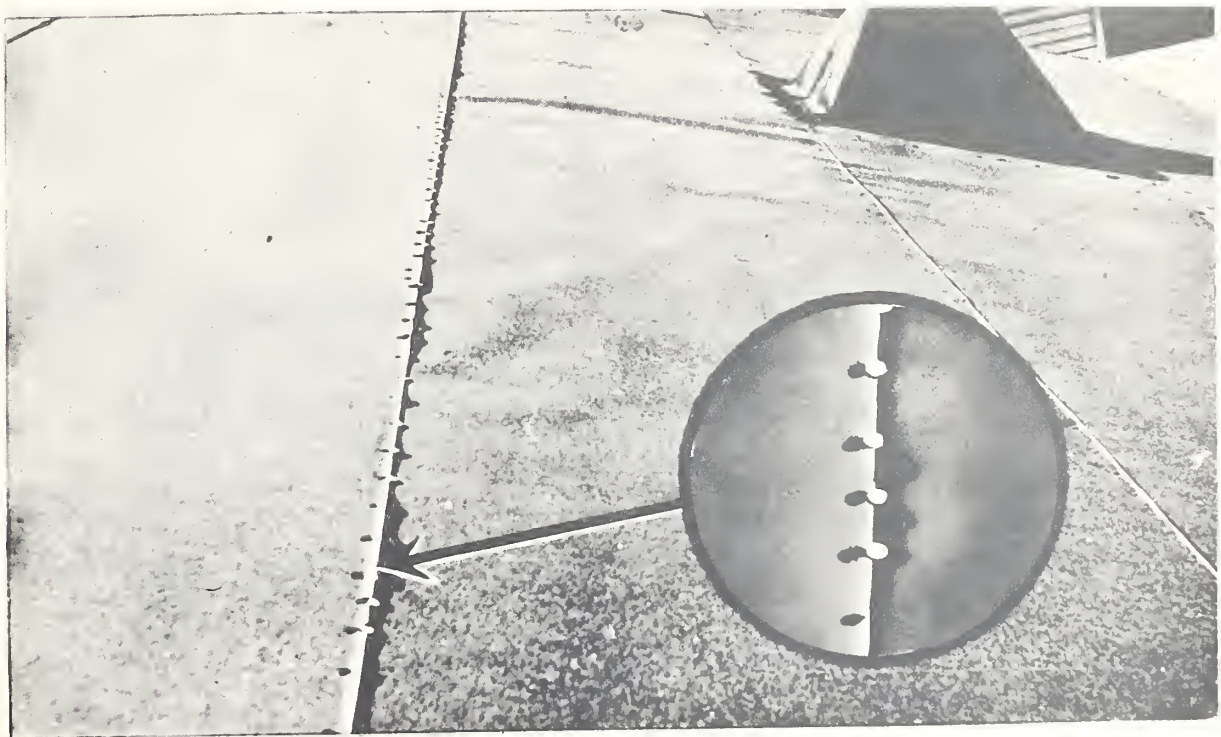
Roll roofing pulling away from nails placed too close to edge of sheet.
